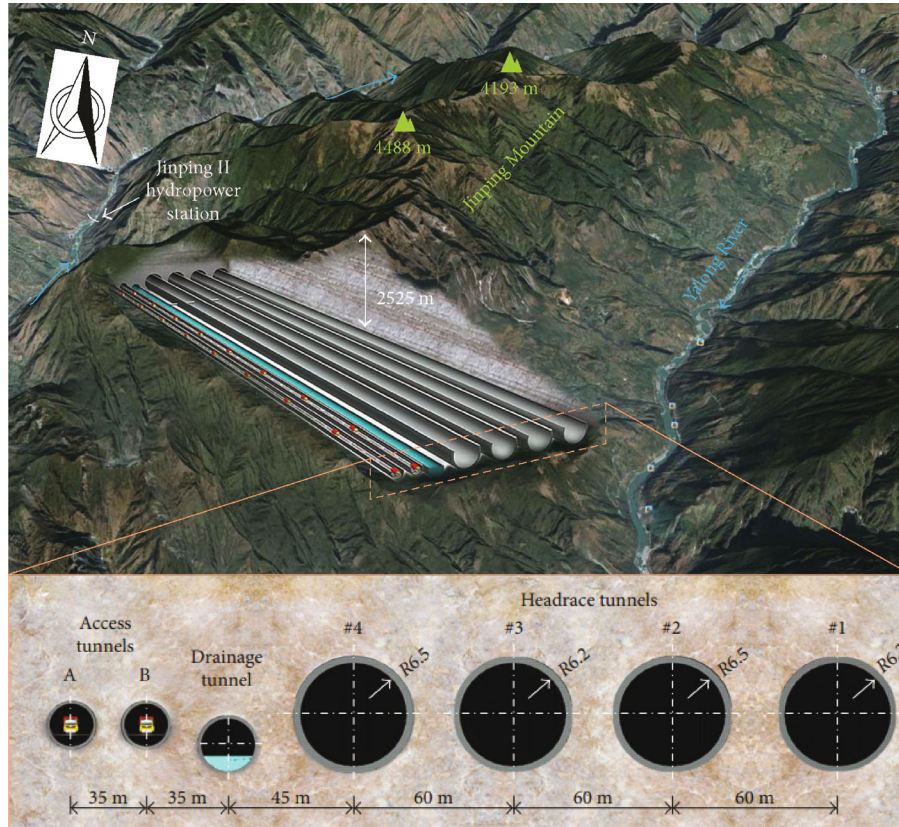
Layout and location of tunnels at the Jinping II hydropower station.
